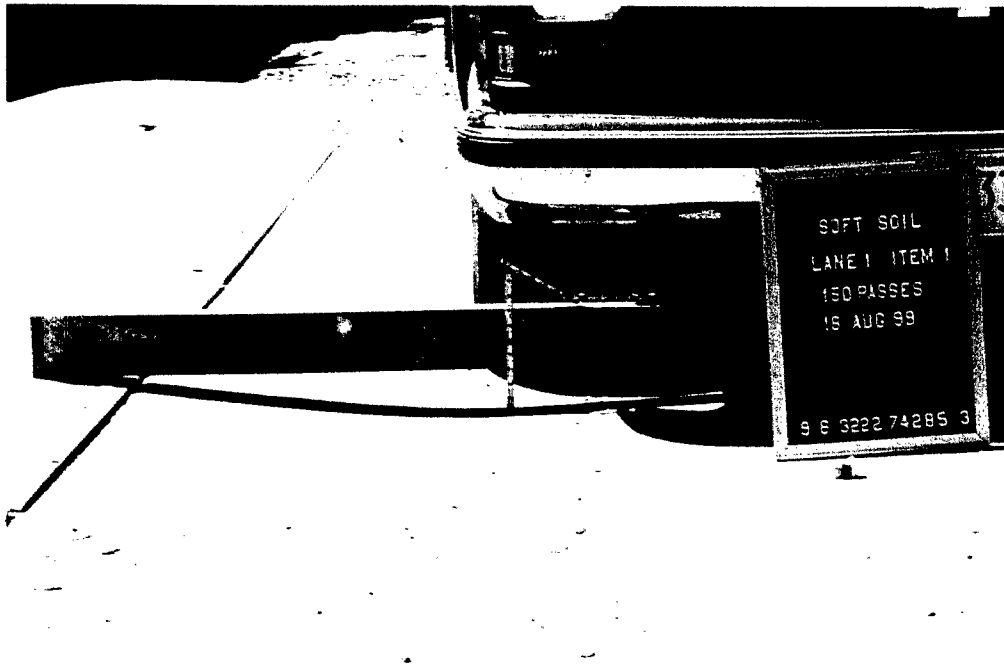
Rutting in excess of 3-in. on Lane 1-Item 1 after 150 truck passes
